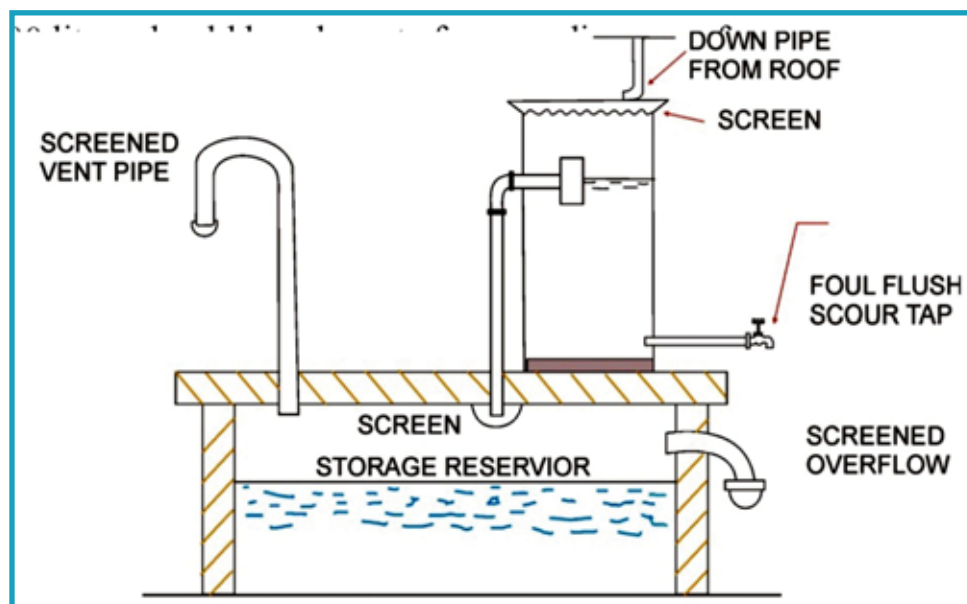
Foul Flush Arrangement for Roof Catchments.
